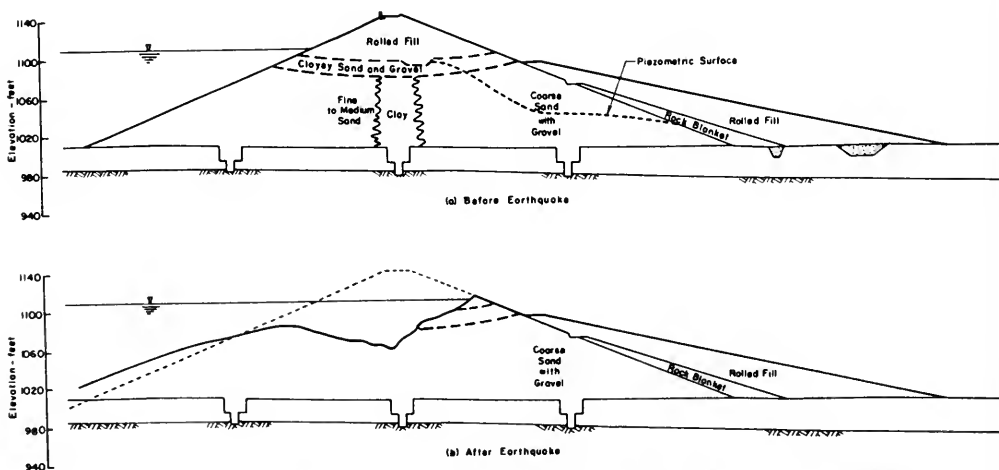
Typical cross-sections through embankment before and after earthquake, Lower San Fernando Dam.
